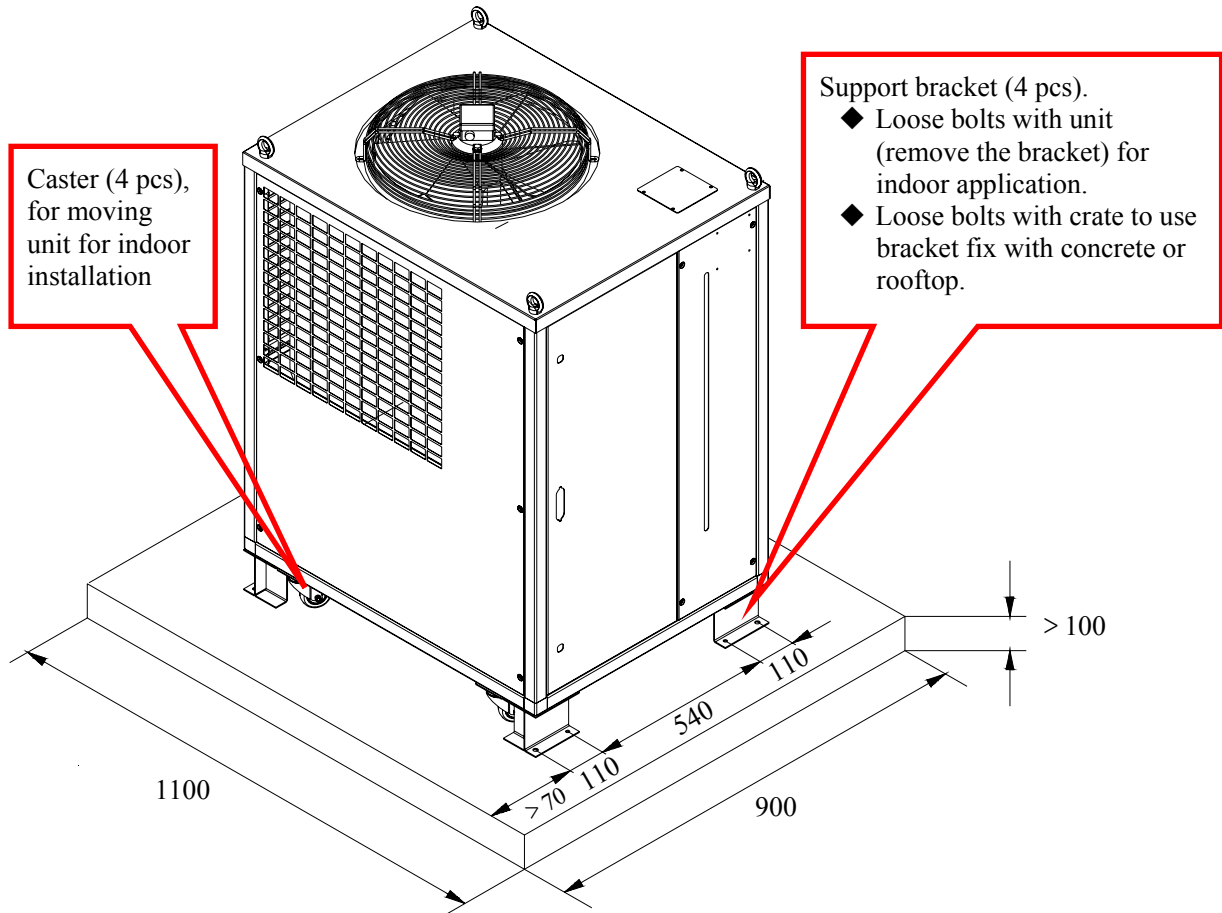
Mounting holes of unit and dimension of the concrete foundation for chiller installation (Unit: mm)
